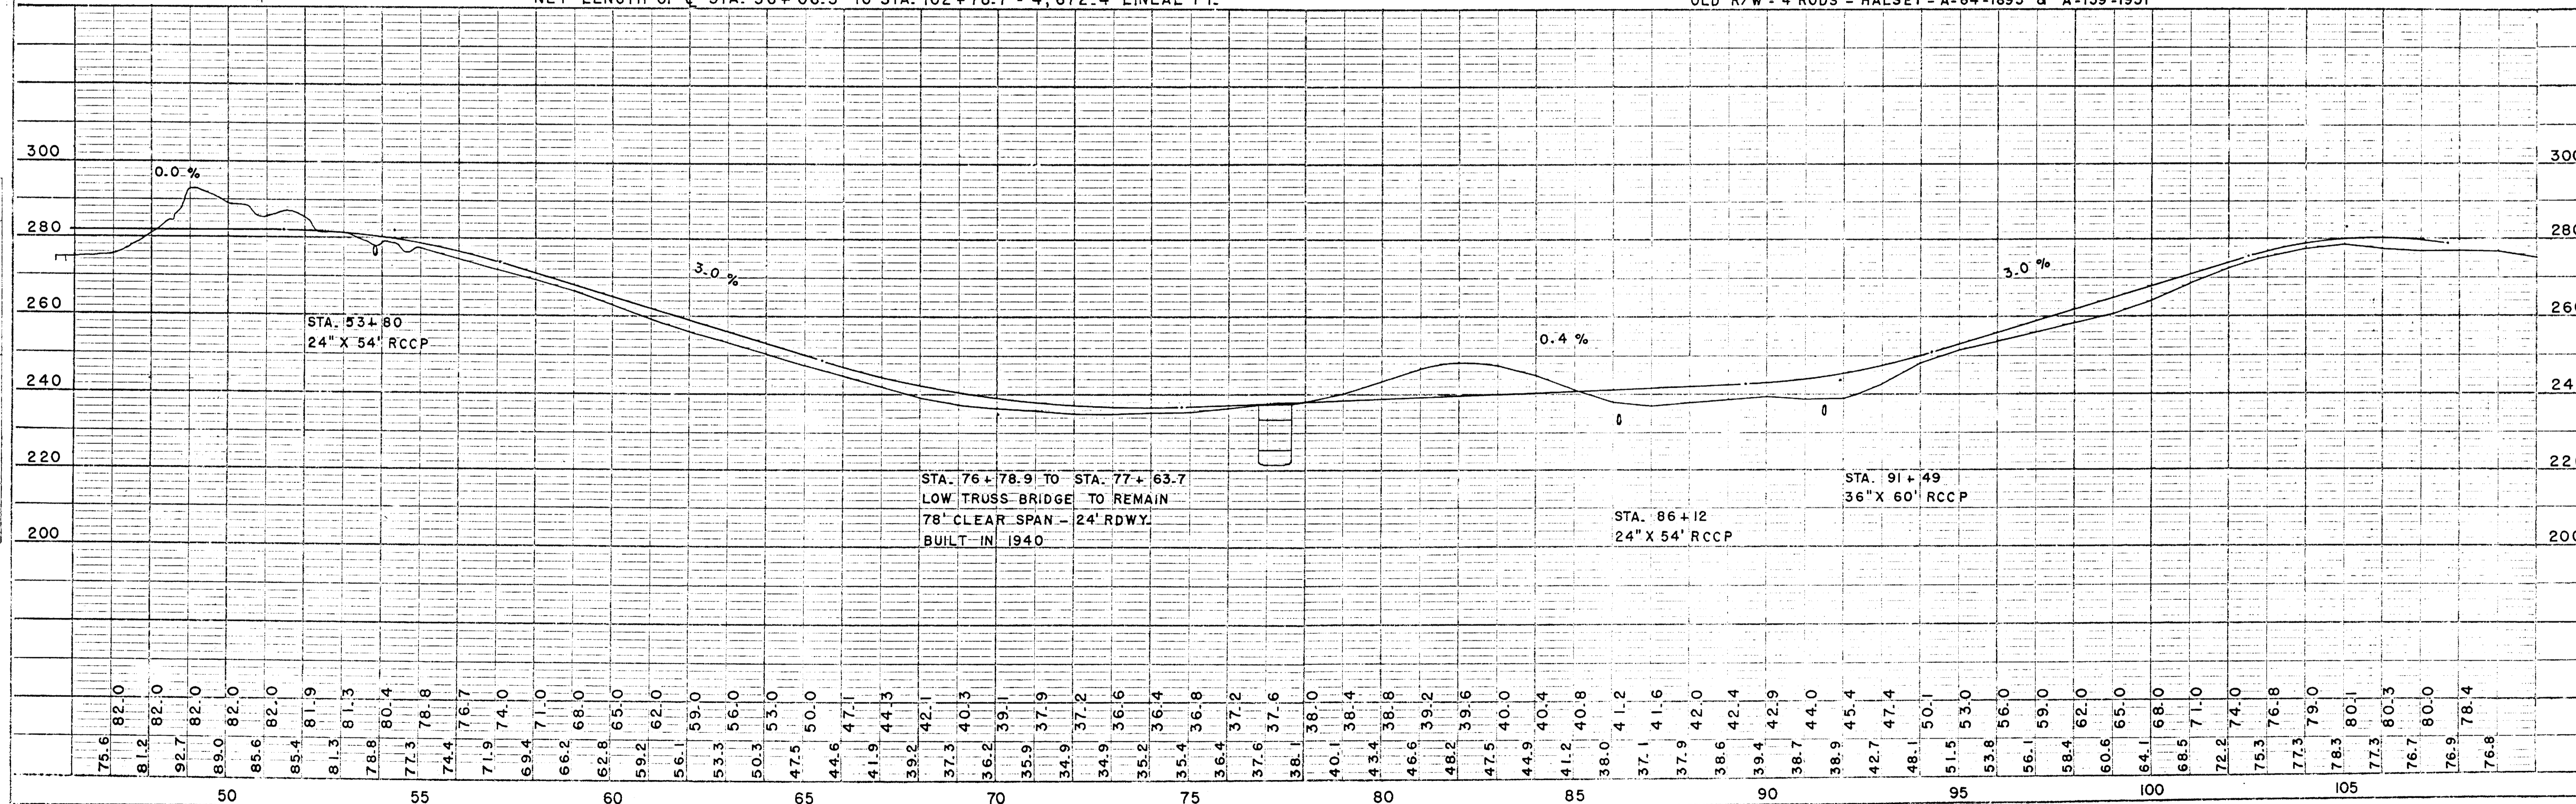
PLAN PROFILE R.P.R. STANDARD
